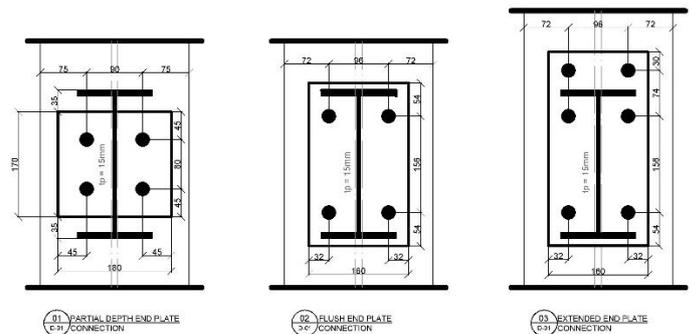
IPE 240 Beam to HEB 240 Column end plate bolted connection details
